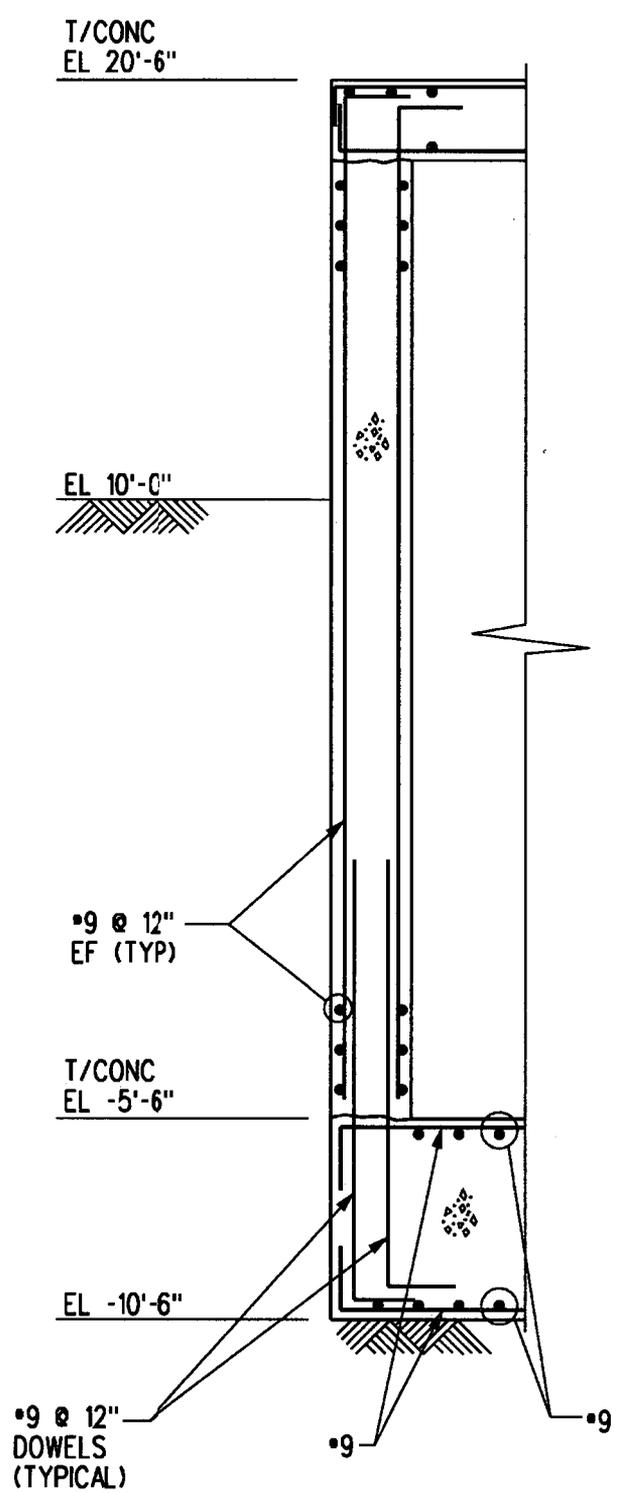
E.4-7 {Reinforcement for UHS Electrical Building North Wall}
